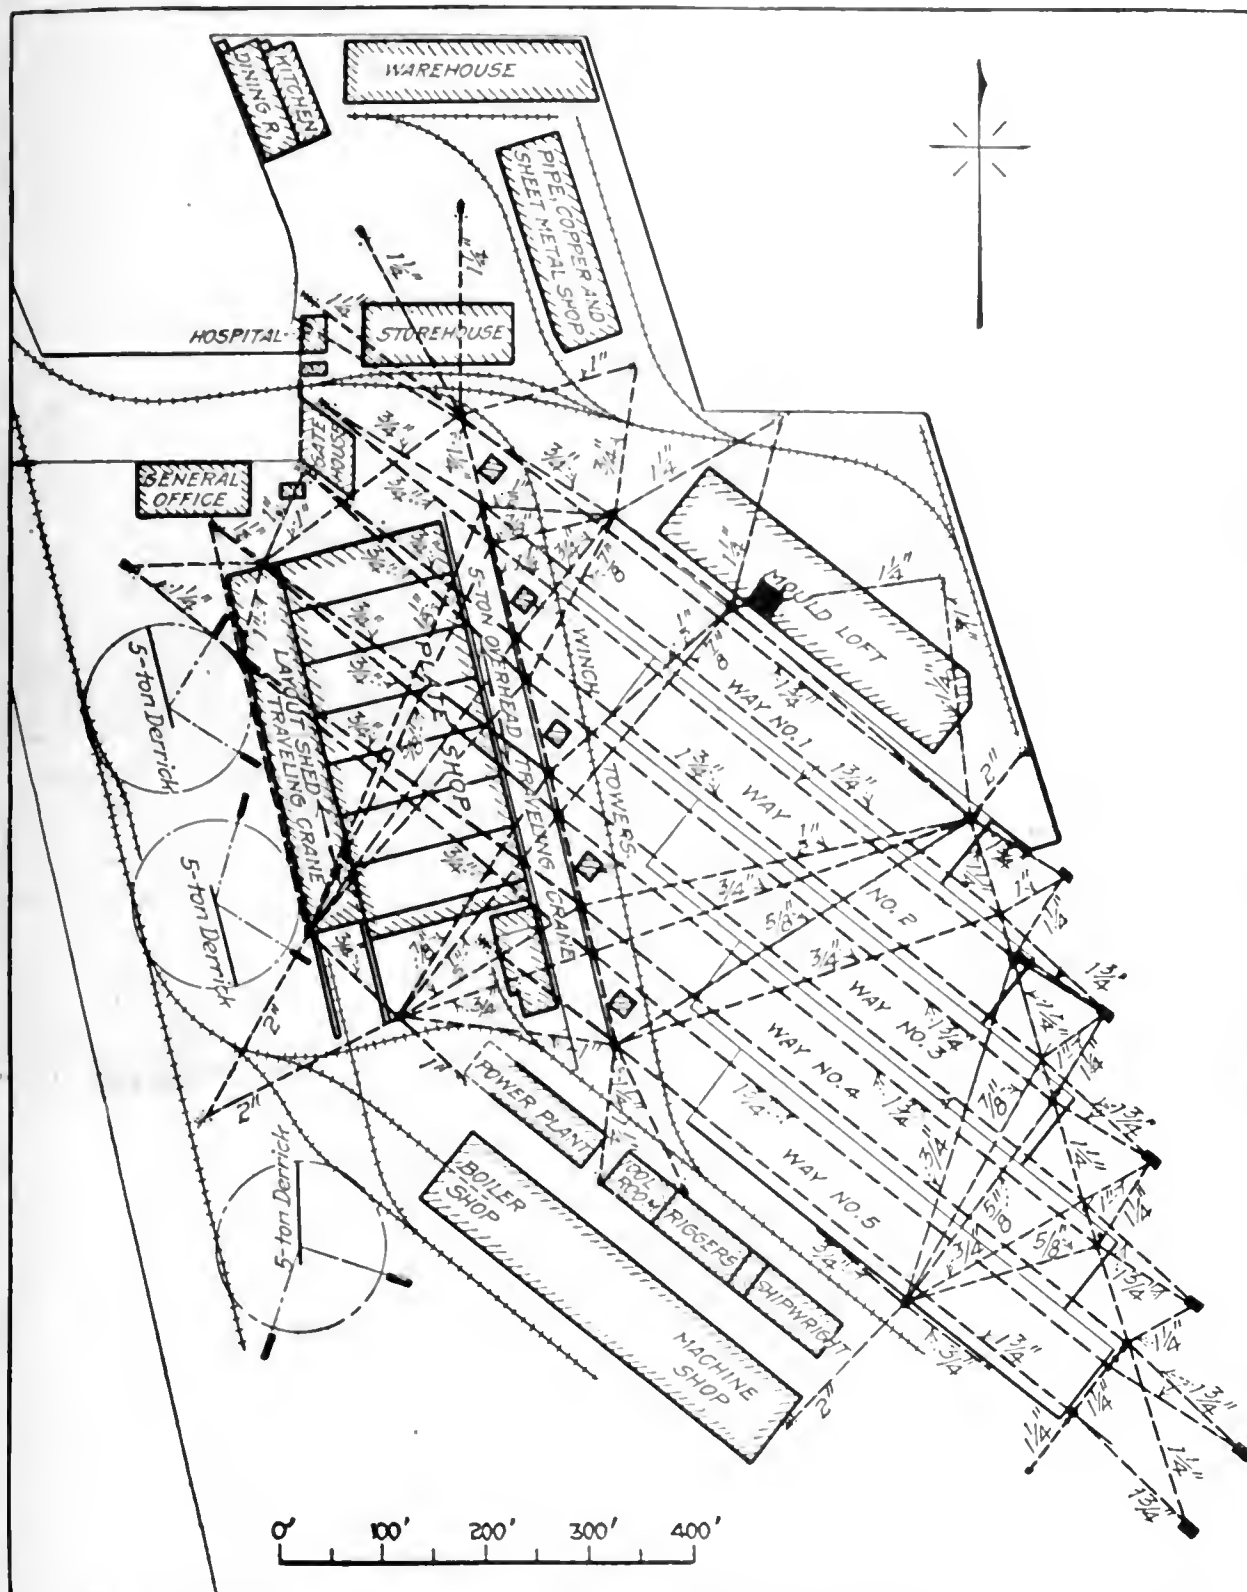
PLAN OF SKEW CABLEWAY SYSTEM, SEATTLE-NORTH PACIFIC SHIP-BUILDING COMPANY
